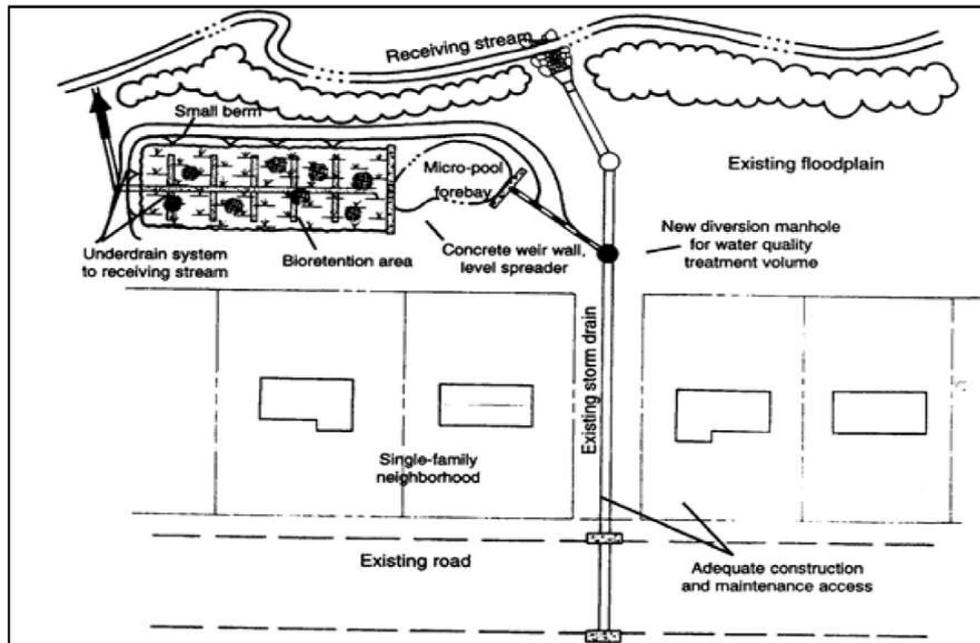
Pipe Outfall Retrofit (Source: Schueler and Holland 2000)
